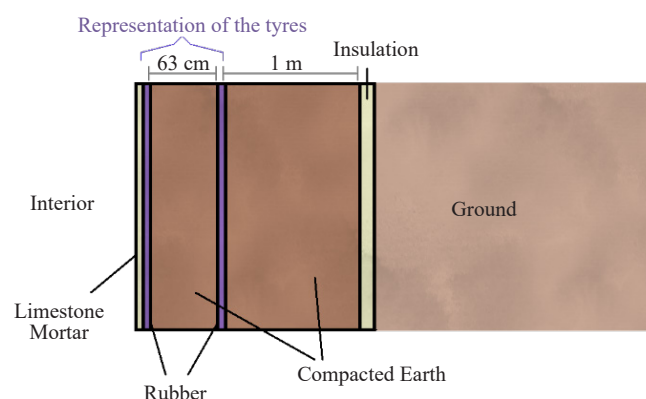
A not-to-scale schematic drawing of the simulated wall structure of the tyre wall
